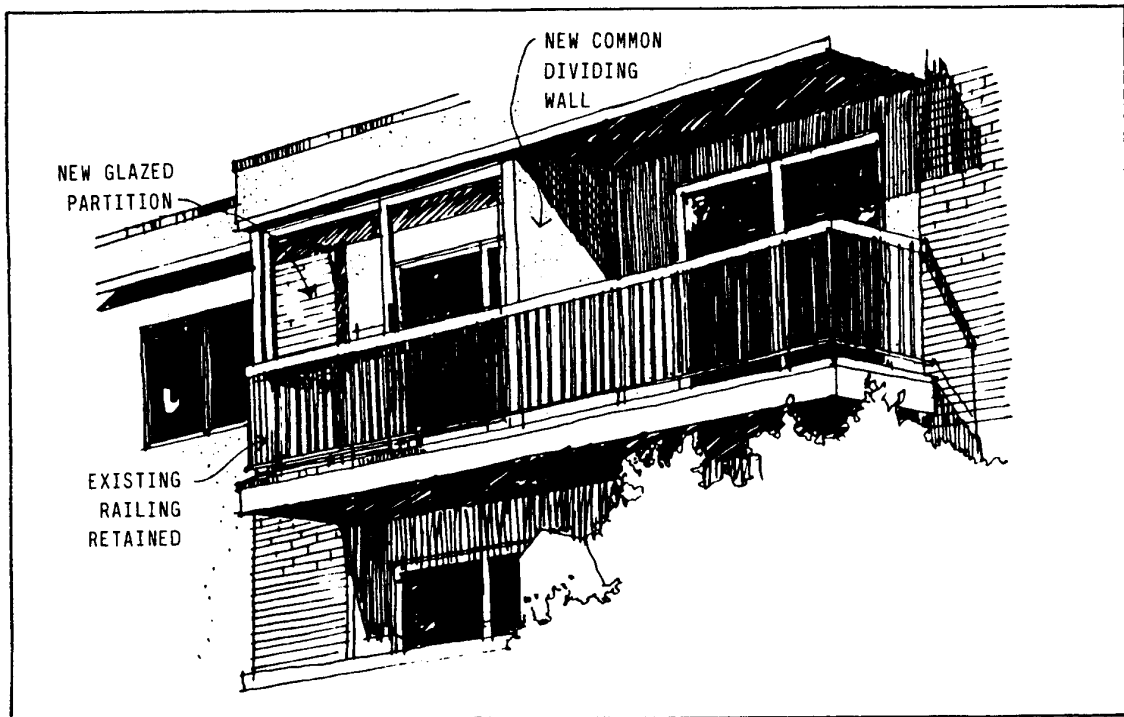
Example of Low-Rise Balcony Enclosure Retaining Existing Balcony and Providing Dividing Wall to Neighbouring Open Balcony
